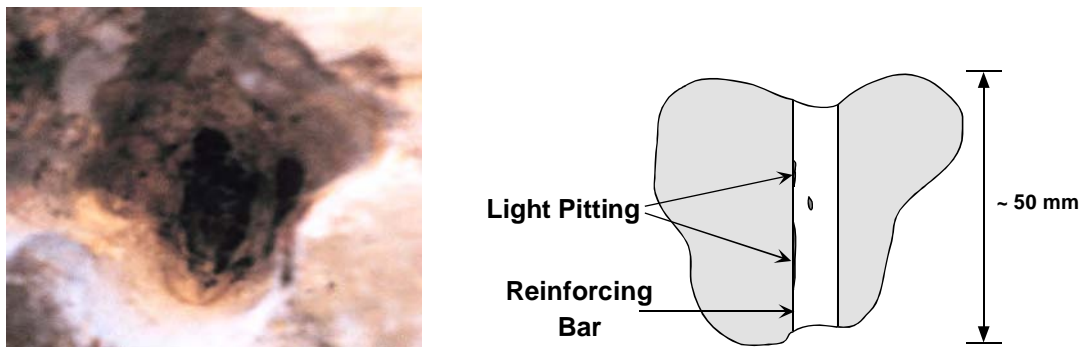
Reinforcing Bar Condition, Specimen DJ-TC-N
